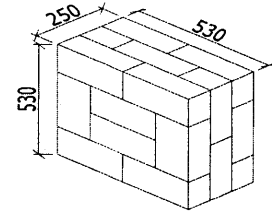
DETAILS OF BRICK BLOCK (530x250x650(H)) (3 LAYERS IN PLAN)
